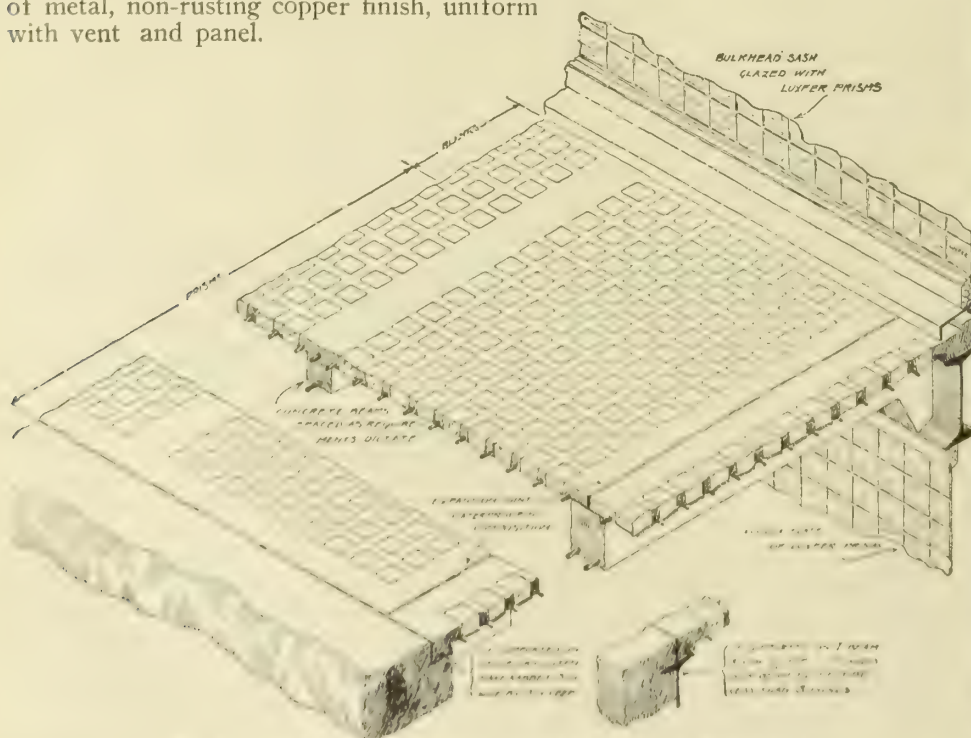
LUXFER REINFORCED CONCRETE PRISM SIDEWALK
